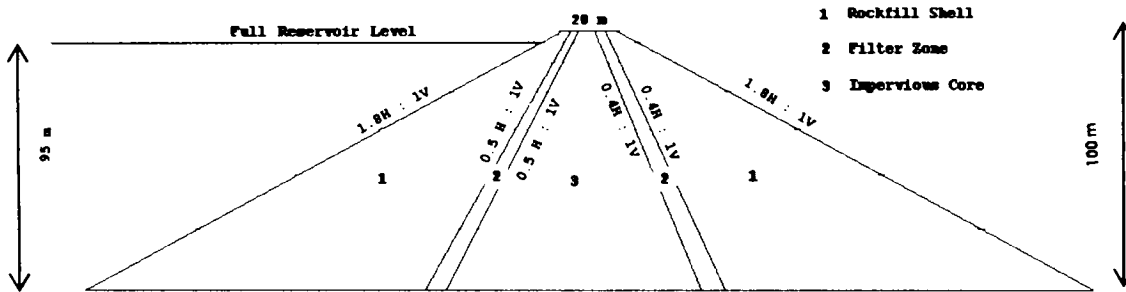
Section of 100 m High Earth and Rockfill Dam
